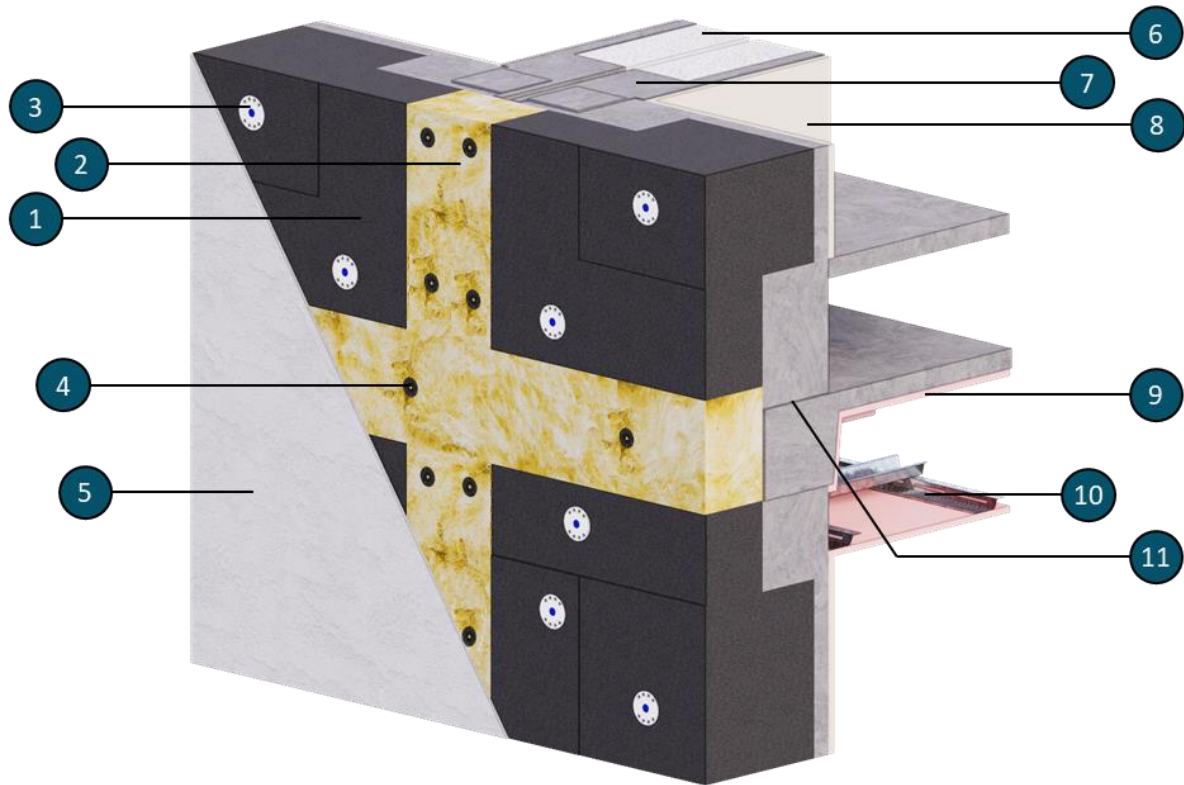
External wall with ETICS façade finish junction with compartment floor and compartment wall
